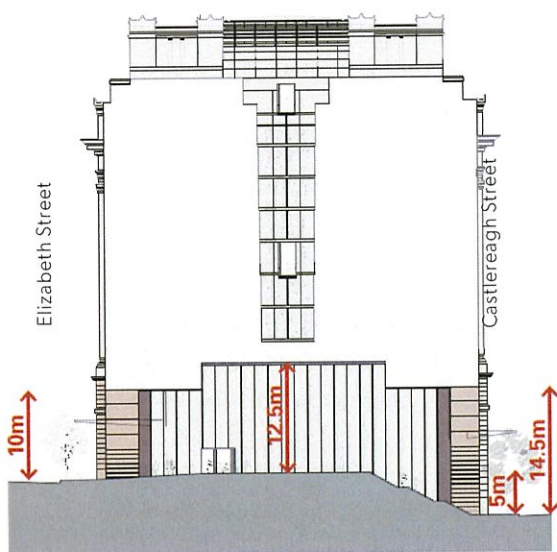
| Section plan showing proposed height dimensions of through-site link (Source: Applicant's RtS)
